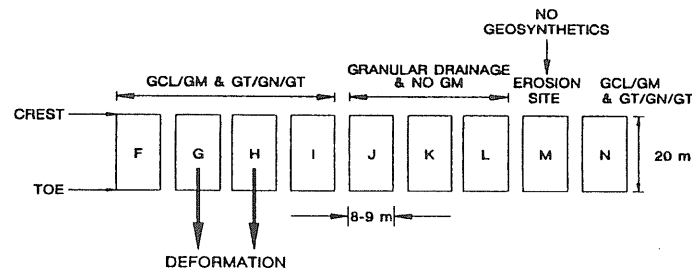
Plan View of GCL Test Pads on the 2:1 Slope
